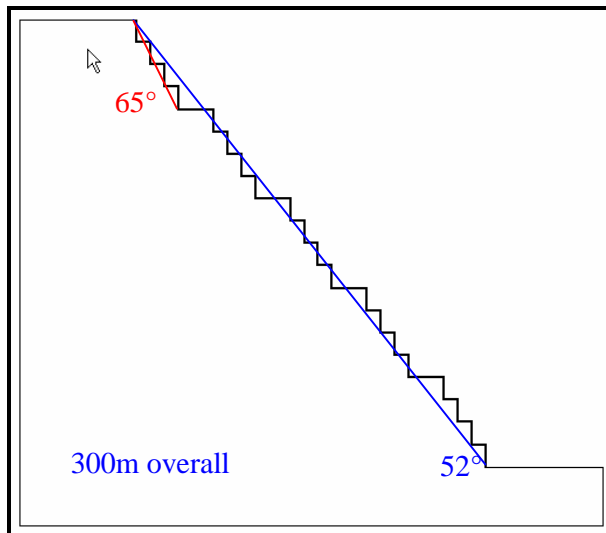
Optimised slope design for Sandsloot west wall Cut 6
